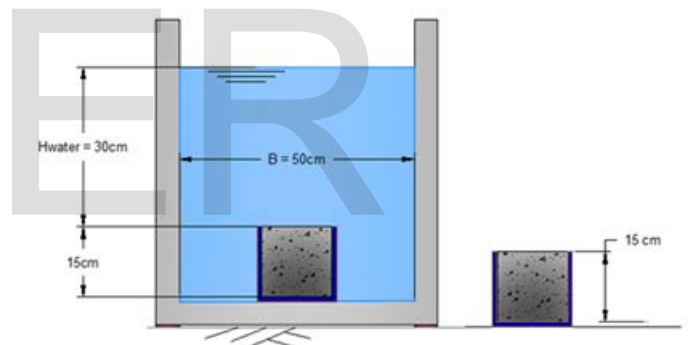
CASTING METHOD OF ANTIWASHOUT UNDERWATER CONCRETE
